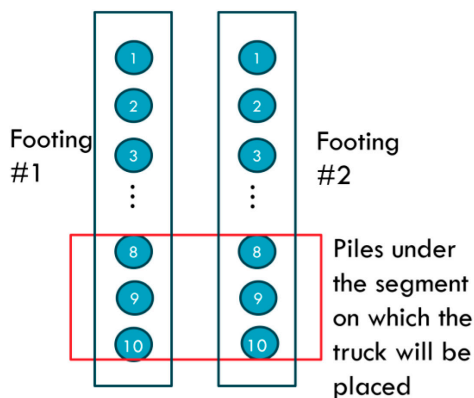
Schematic of the Pile and Footing Numbering System.
